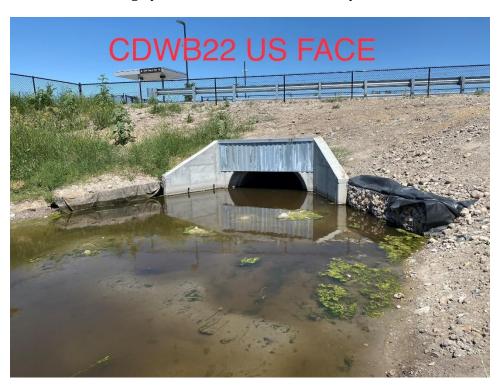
Looking downstream at CDWB22A 8-ft RCP culvert.
